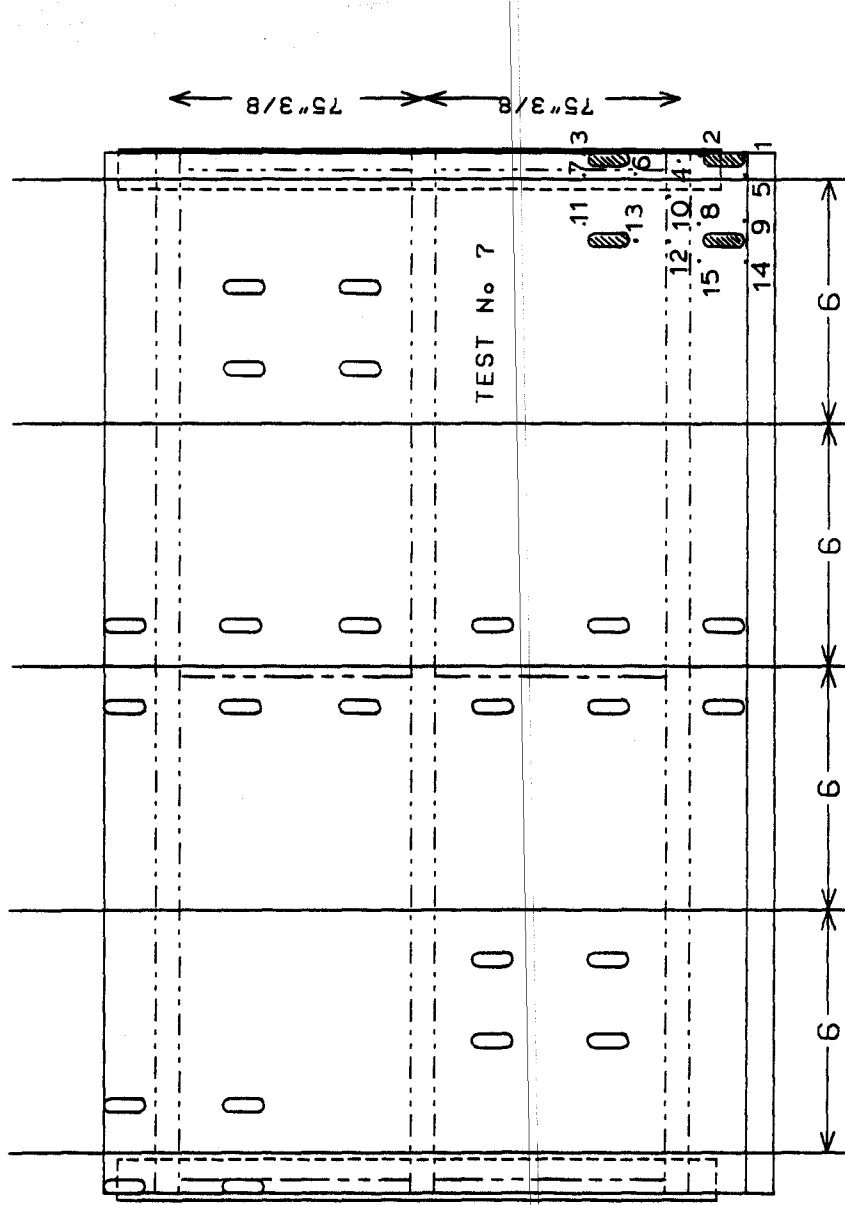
LVDT Locations (Second Bridge - Test No. 7)
